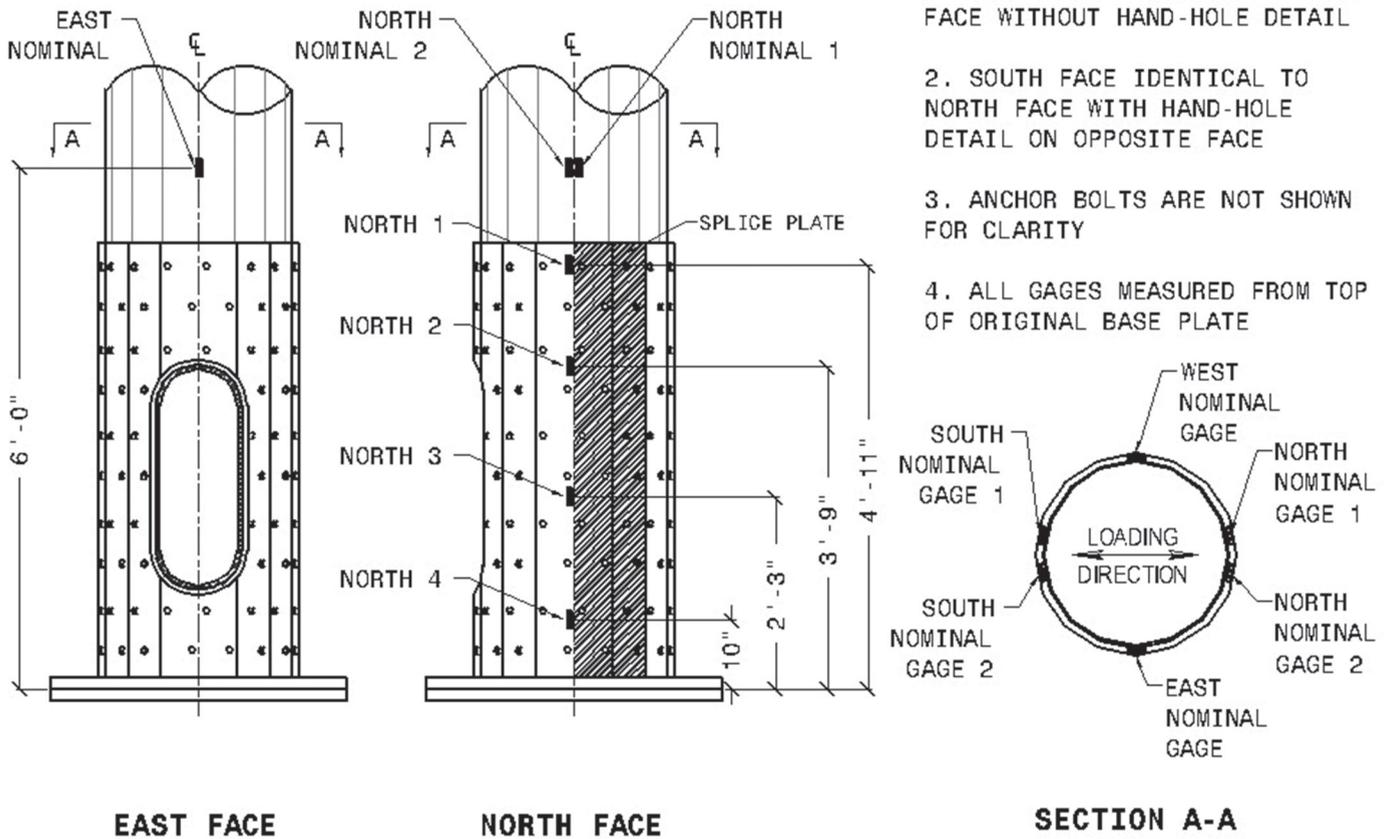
Dimensions and strain gage layout of tall-jacket specimen.
